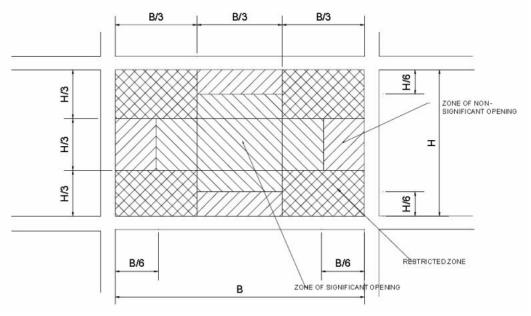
Possible location of openings in load-bearing infill wall (Ministry of physical planning and works, 1994)
